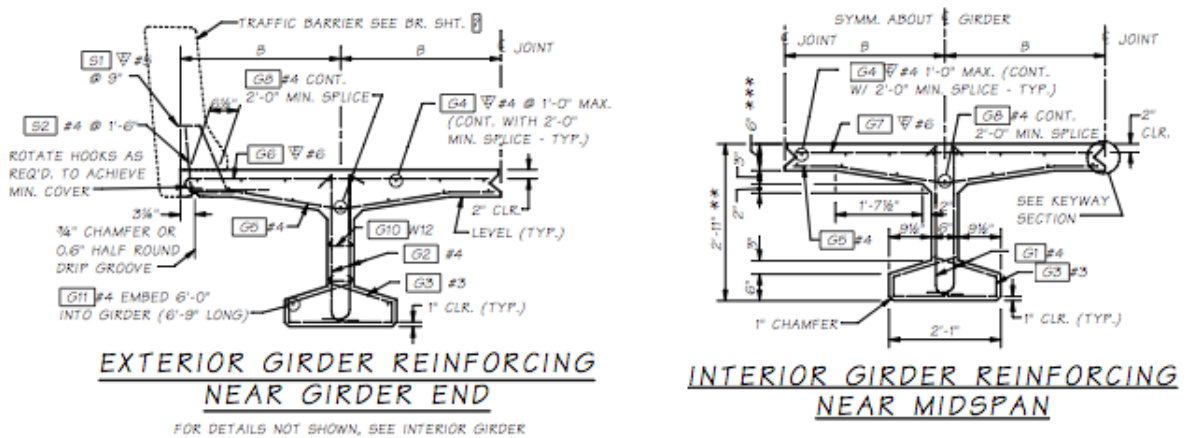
Deck bulb-T bridge girder (Washington) (WSDOT, 2010)
